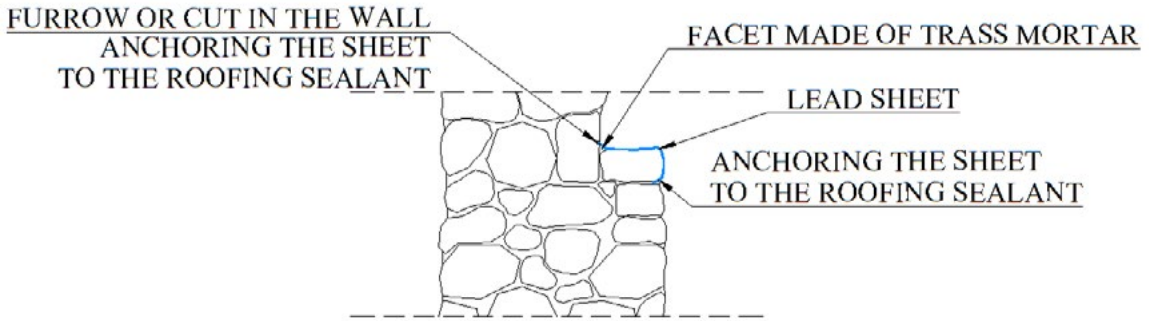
Figure 6 Cross-section of the step secured with the lead sheet
